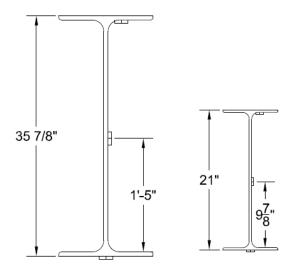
Gage location on Indian Purchase cross section of floor beams and stringers respectively
